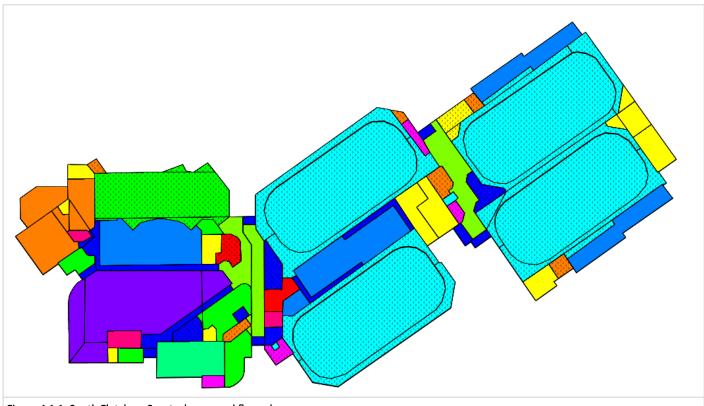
South Fletchers Sportsplex ground floor plan
